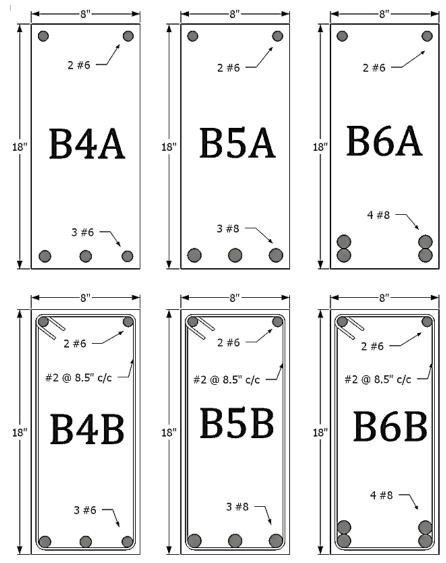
Dimensions and Reinforcement Detail of Test Beams
